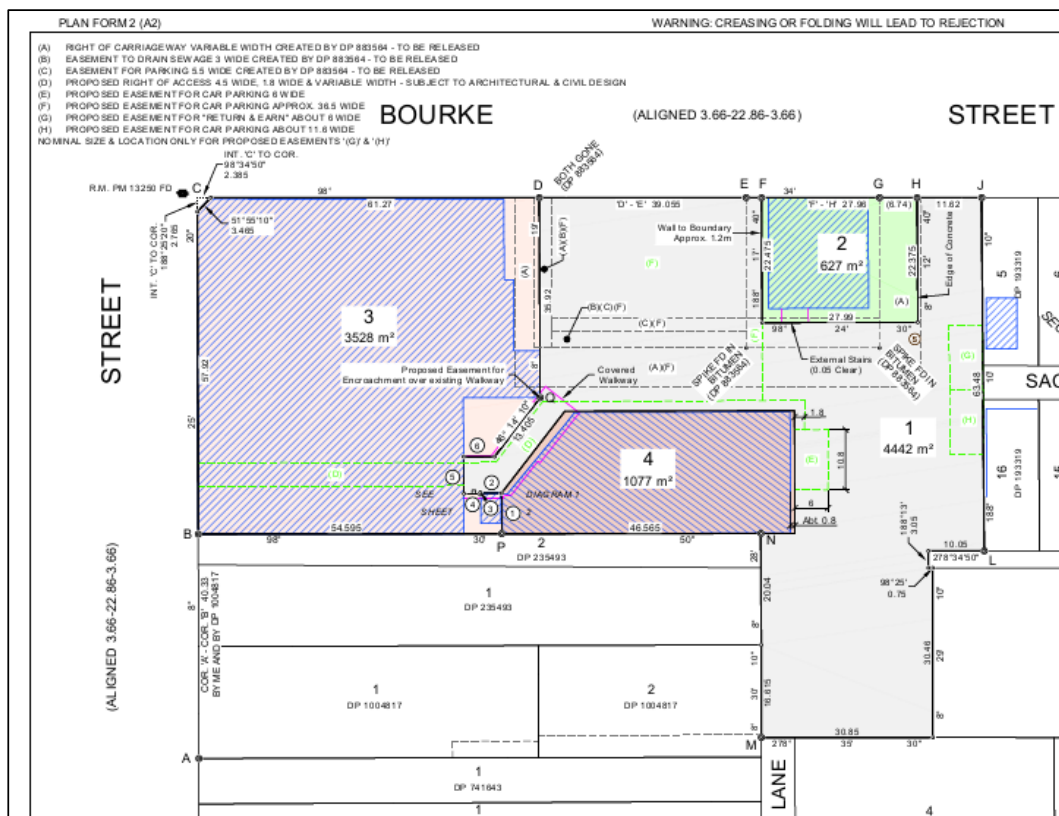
Extract of Proposed Plan of Subdivision showing proposed lots 1 – 4 (Source: New England Surveying and Engineering)
